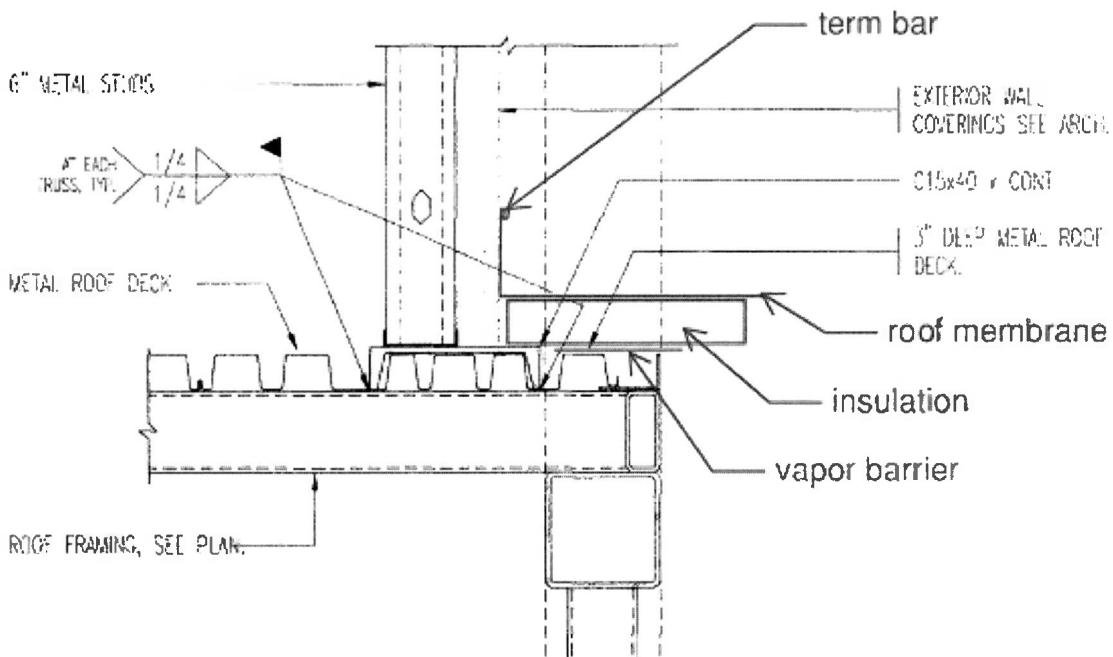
as constructed there is no thru wall flashing to remove water that goes thru the brick.
